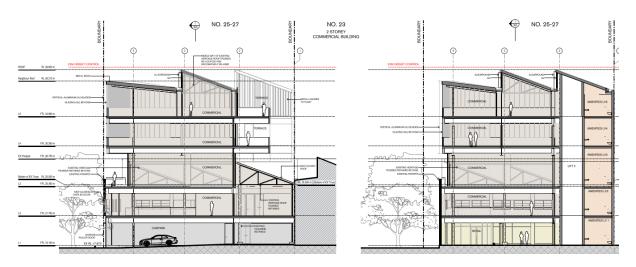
Proposed Section Plan 2 and 3 looking west through the building
